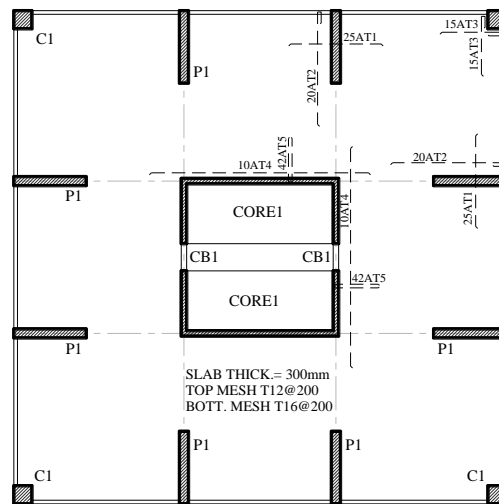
Typical reinforcement details of floor slabs - 18 and 26St buildings
